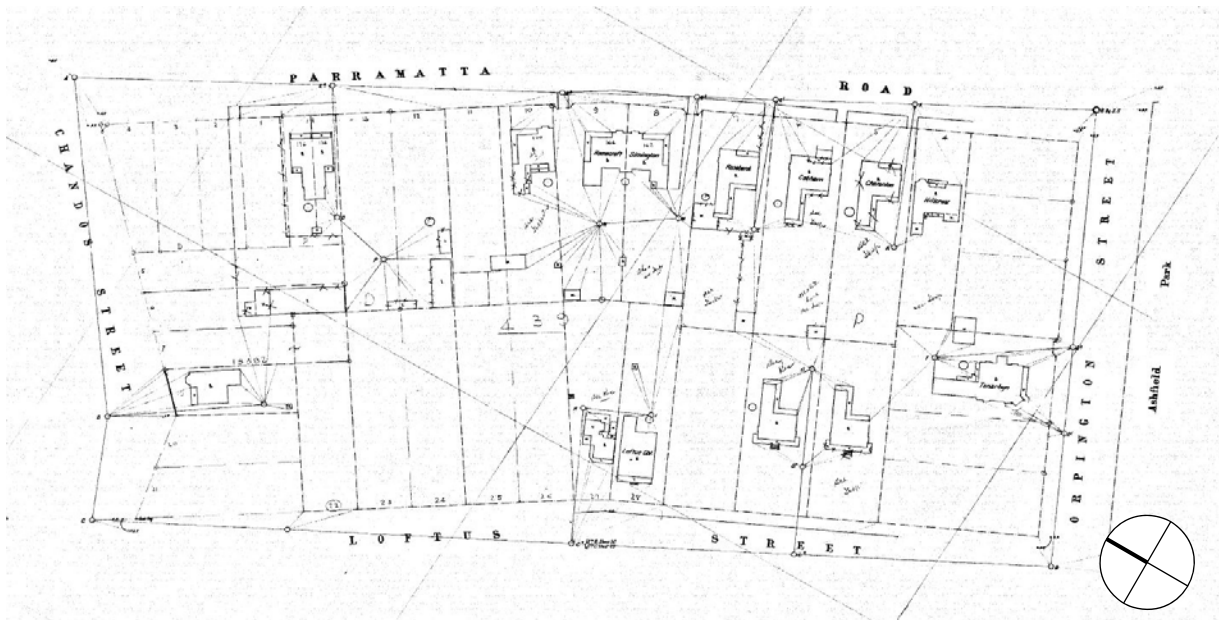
1892 plan showing development on section 14 (above) on southern side of Parramatta Road between Chandos Street and Orpington Street. (Source: Sydney Water Plan Room, Sheet 48)
